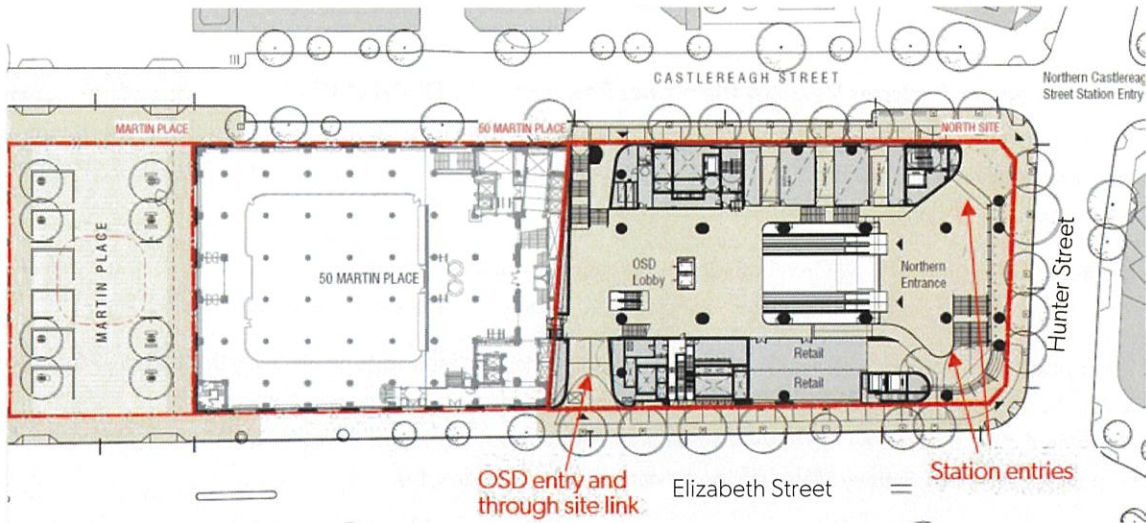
| Ground Floor Plan showing station entry, OSD lobby, vehicle entry and retail (Source: Applicant's RTs)
